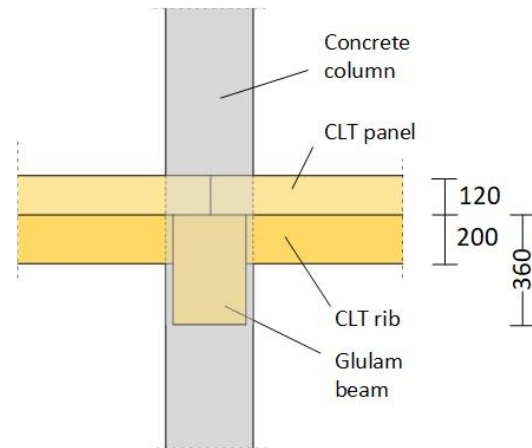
Cross section of connection CLT rib panel floor and glulam beam
